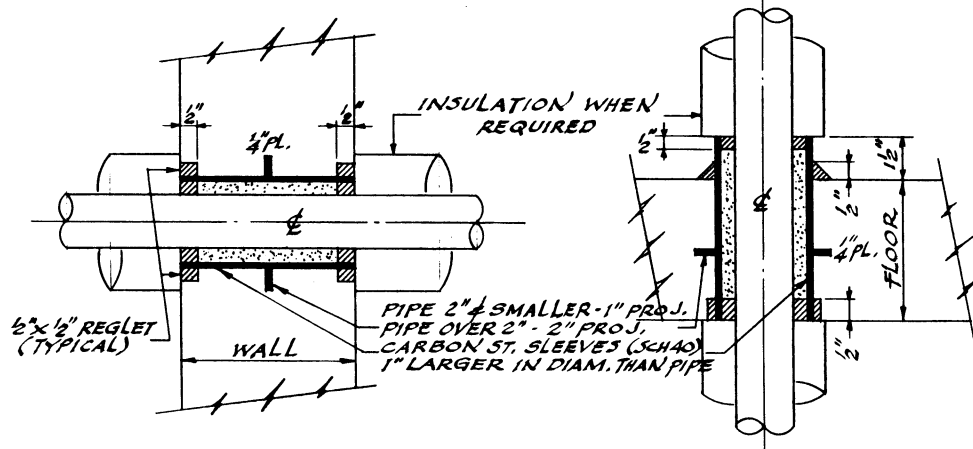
Containment air seal details of piping penetrations, details "F", "G", "M", and "O".
